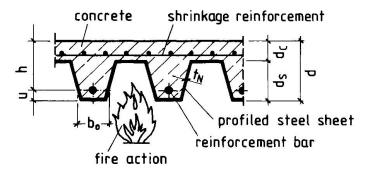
Unprotected profiled steel sheet floor with fire action from below
